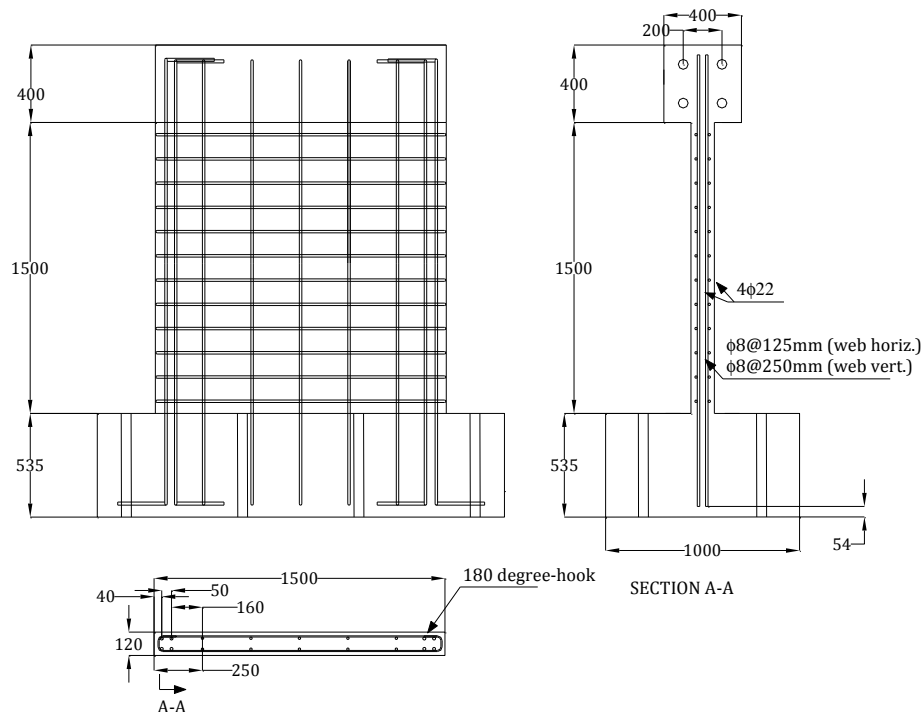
Geometry and wall reinforcement of specimen T5-S1.
